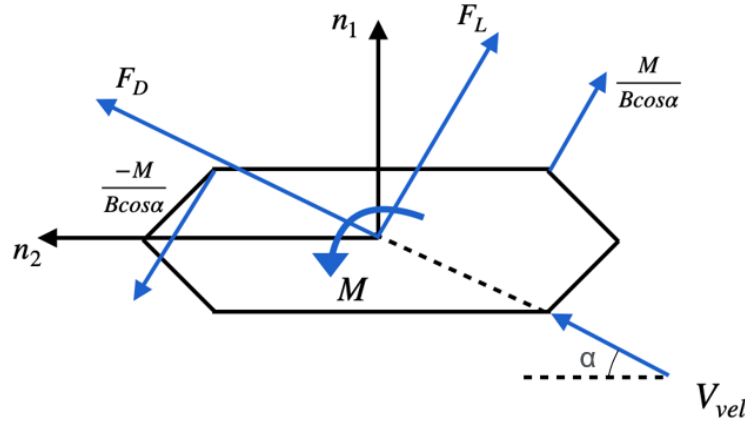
Wind loads on the girder cross section when the wind is coming from west
